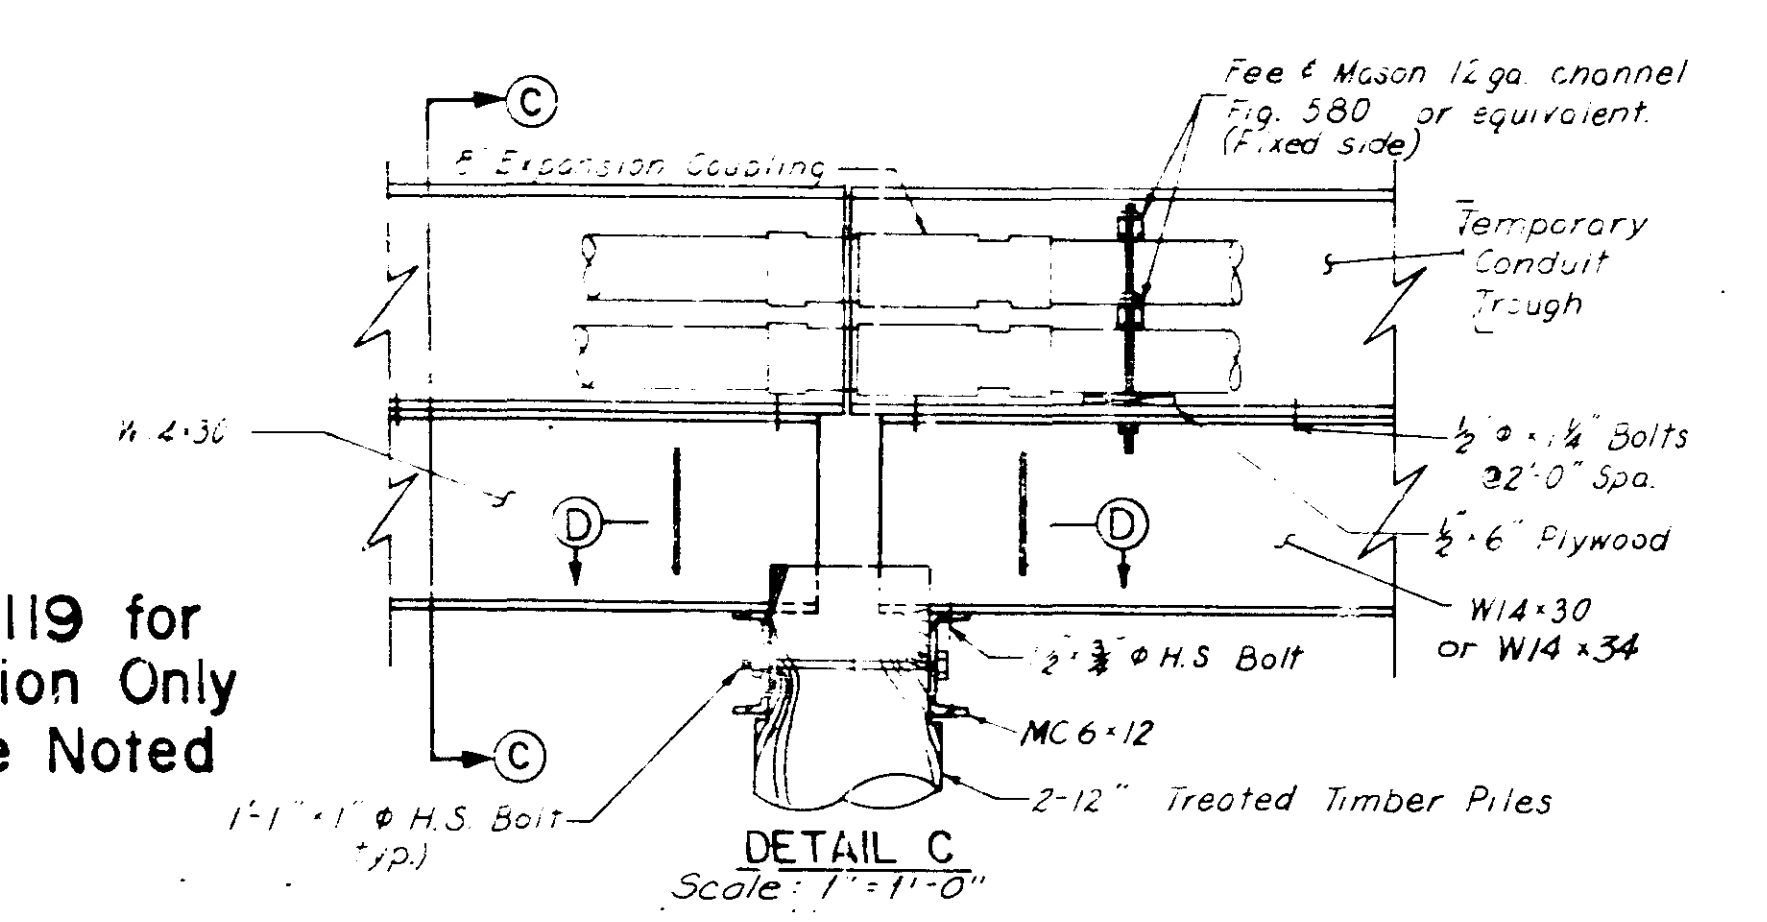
WALL-I & PIER 8-WALL III
